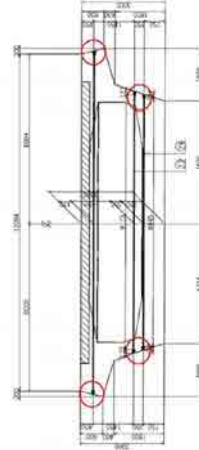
Location of the Anchorages of Cross-section wise Cables inside Cross Beam (A2)
